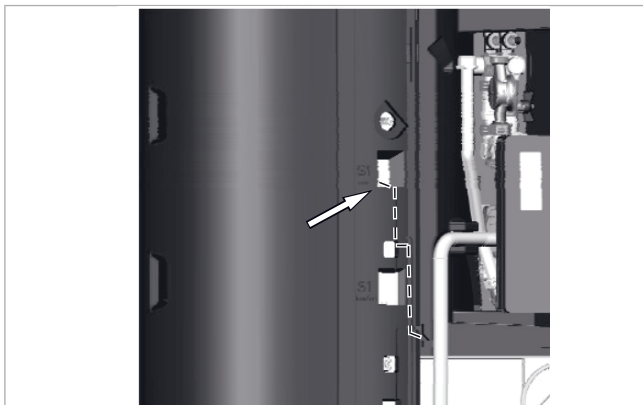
Fitting sensor S1 in position "S1 Eco"
